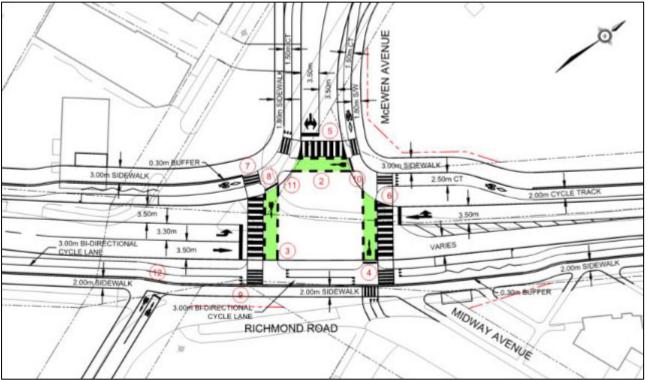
Richmond Road at McEwen Avenue Intersection Modifications
